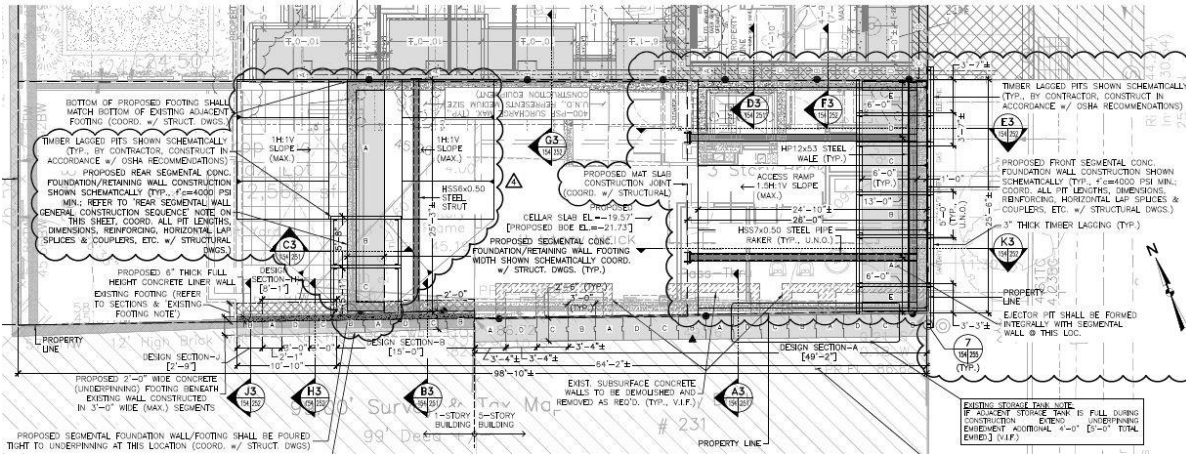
1954 Classroom Addition Proposed Townhouse Underpinning Plan
